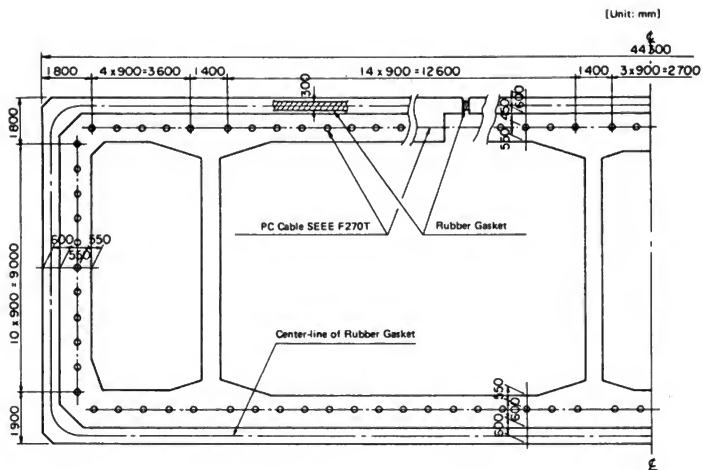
Example of Standard Cross Section and Joint Structure of A Submerged Tunnel
